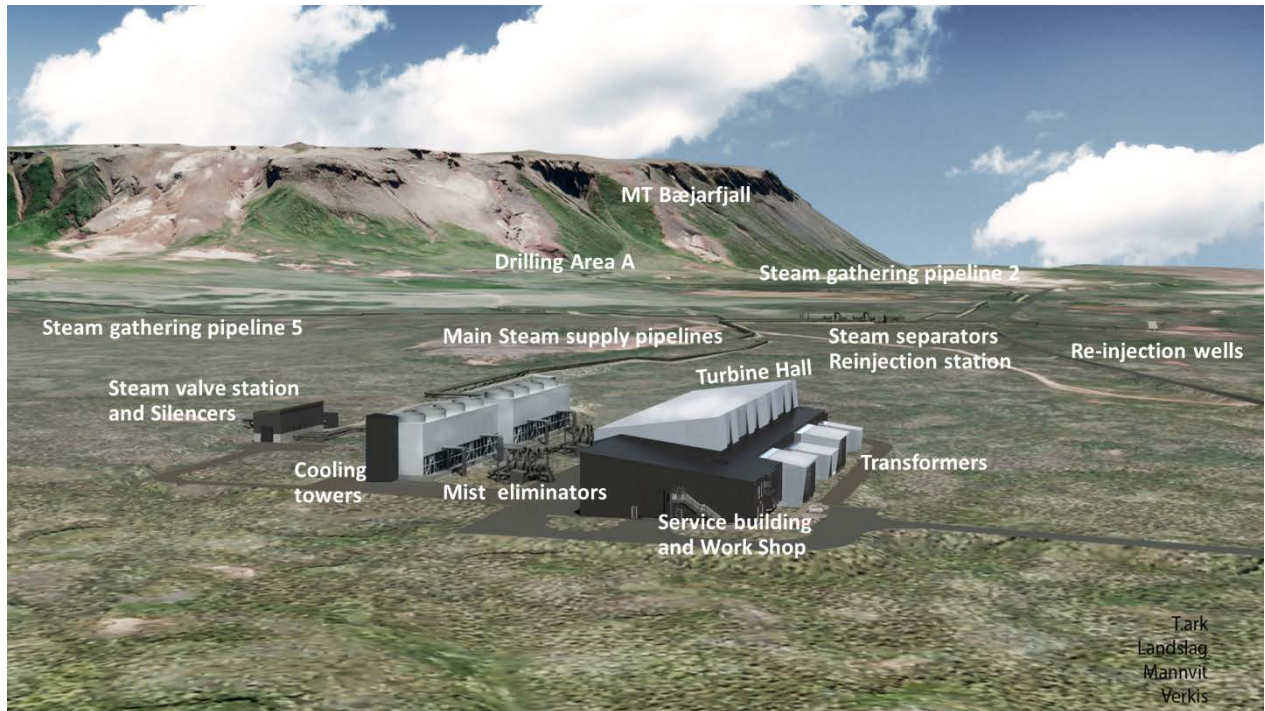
Overview of the power plant, showing the power house, consisting of turbine hall, service building and workshop, cooling towers and buildings and equipment of the steam supply.
